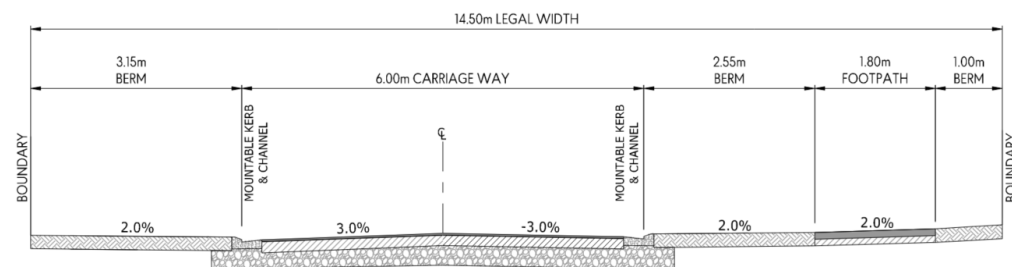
Typical Cross-Section (H) Local Road - 14.5m With Berm
